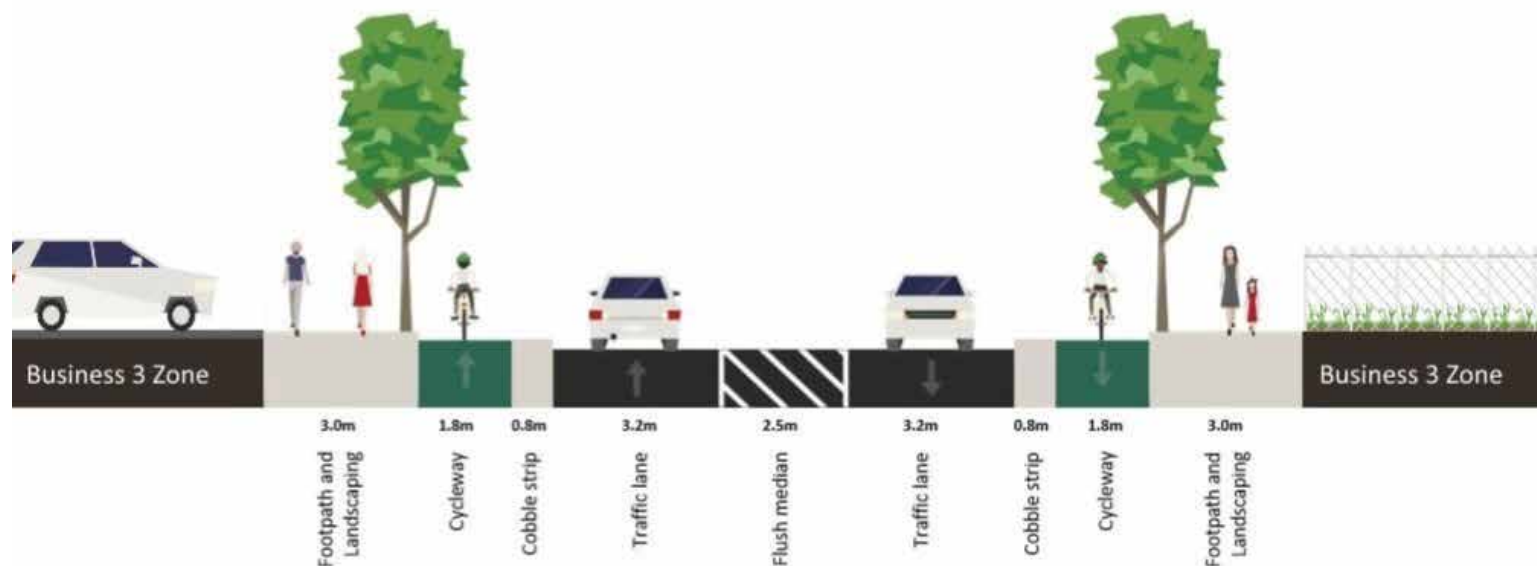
Retail Core (West) Precinct - Cross section of Gerald Street
